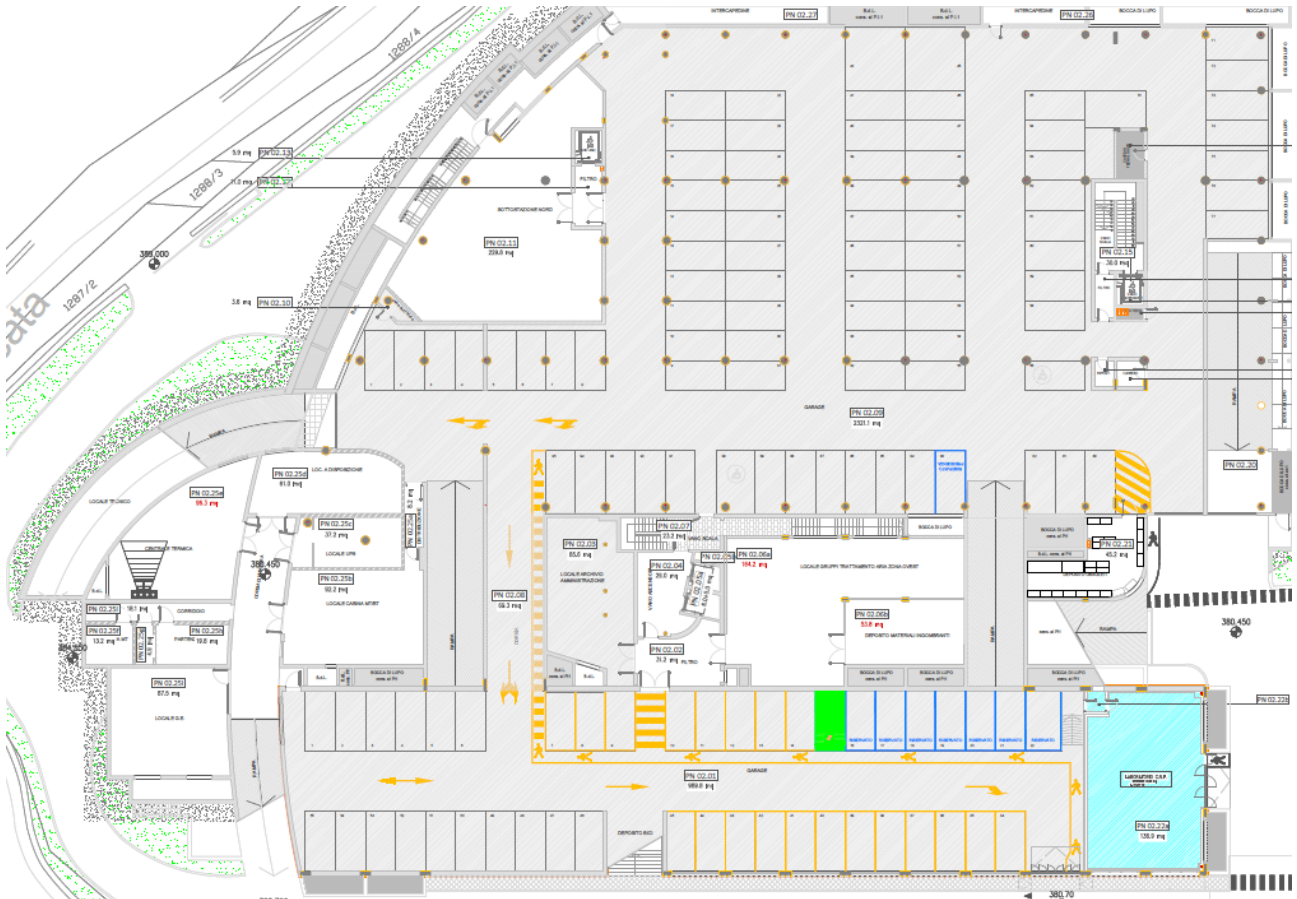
one of the underground floors with 95 parking spaces at the via Sommarive site
